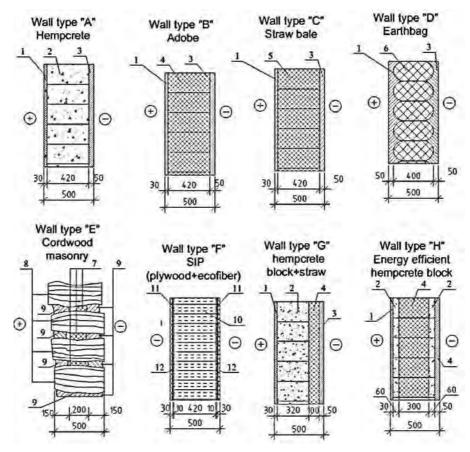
Cross sectional scheme of considered wall types (1 – internal lime-sand plaster; 2 – hemcrete; 3 – external lime-sand plaster, 4 – adobe; 5 – strawbale panel: 6 – earthbag; 7 – chopped straw as insulator; 8 – cordwood; 9 – lime-sand plaster; 10 – ecofiber; 11 – lime-sand plaster; 12 – plywood)
